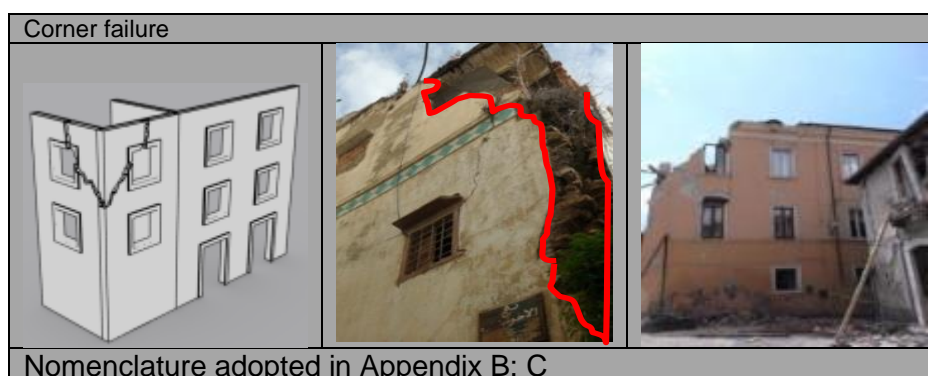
Corner failure due to flexible floors. Examples of buildings in the historic centre of Algiers in Algeria (left) and L'Aquila in Italy (right)
